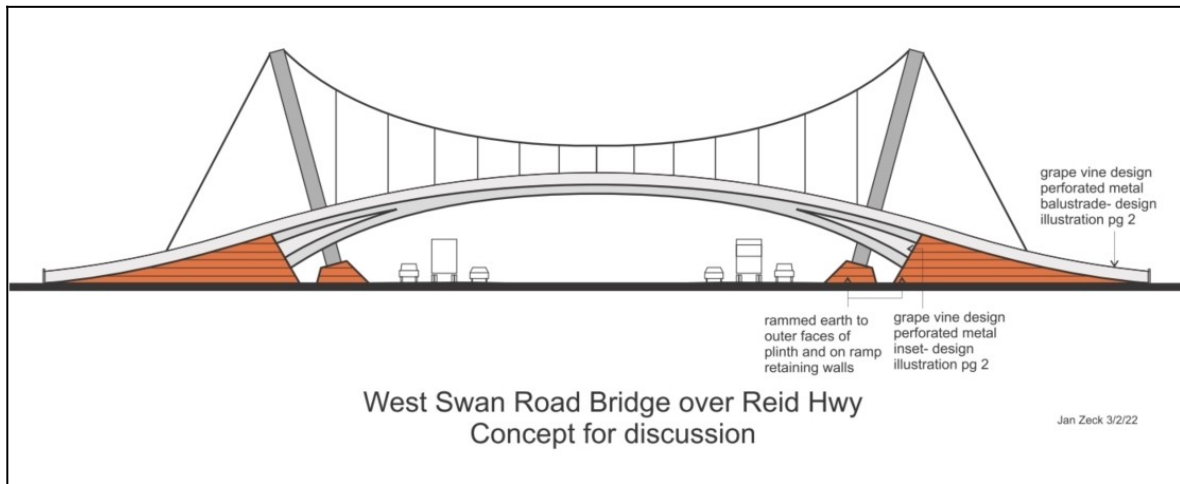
A concept design of a bridge at the West Swan Road and Reid Highway intersection.
